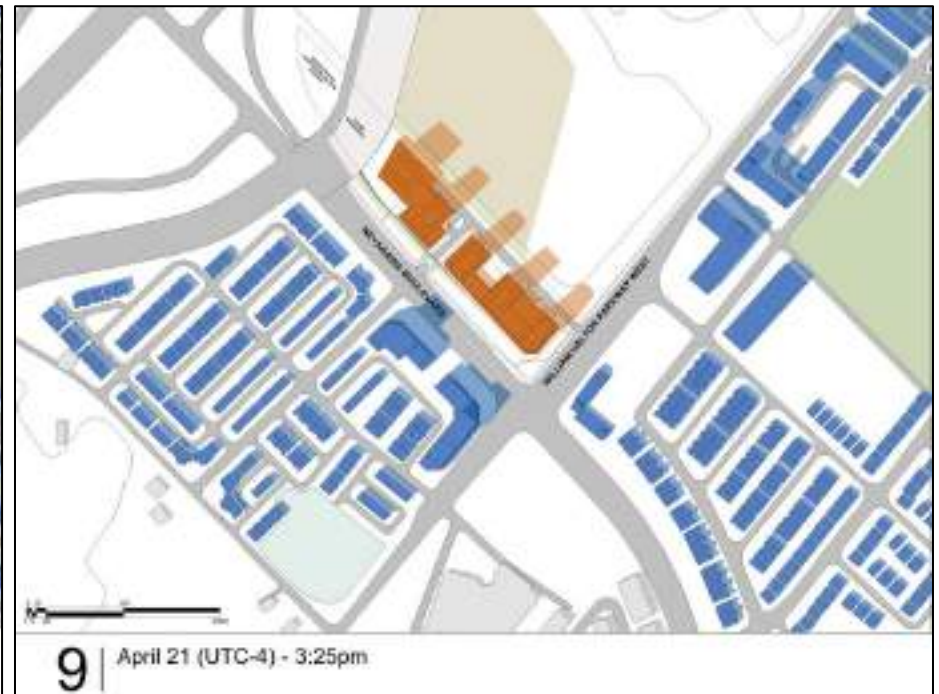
Sun Shadow of the Subject Site at 15:25 on April 21
